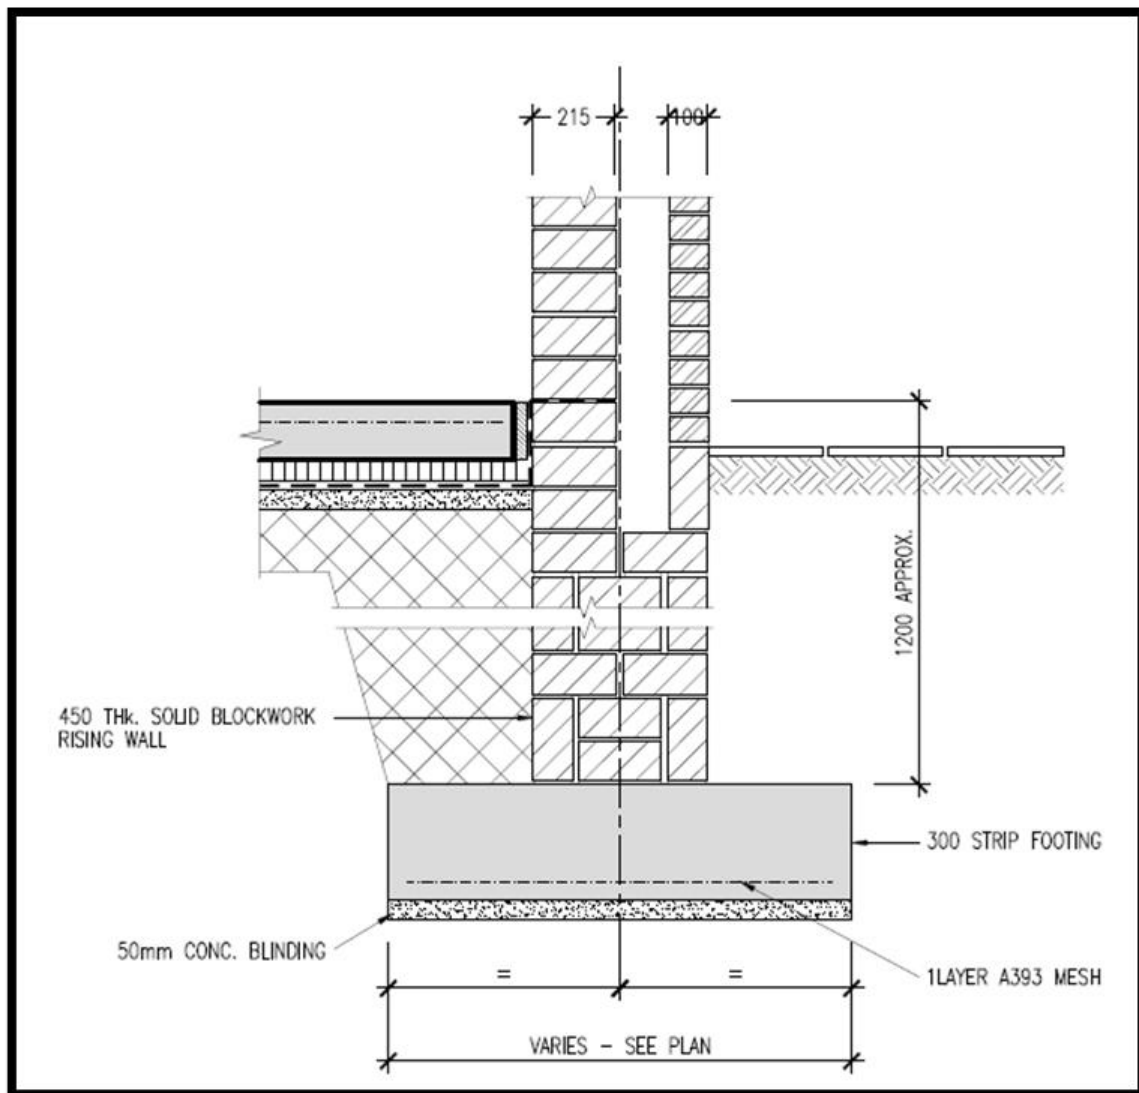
Sample section through strip foundation external ground boundary in future/permanent condition.
